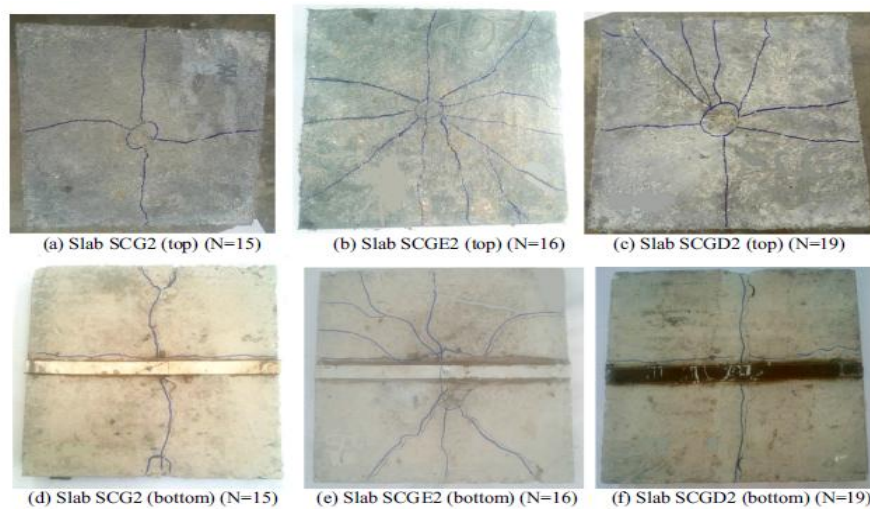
Developed Cracks and Failure Zone of SHCC-strengthened Slabs (Elnagar et al., 2019)
